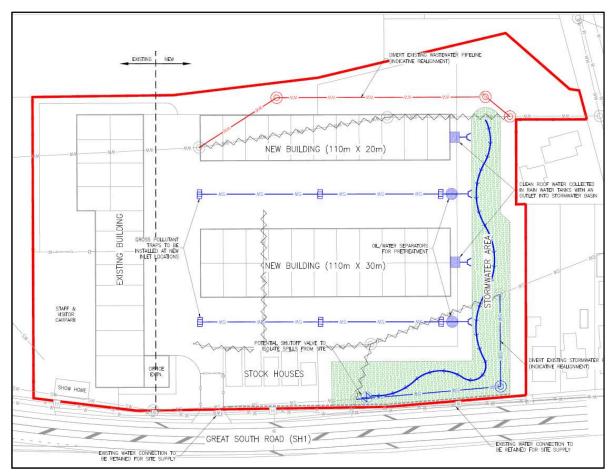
Screen shot of indicative stormwater plan – detailed plan ref C-0012- Rev B
